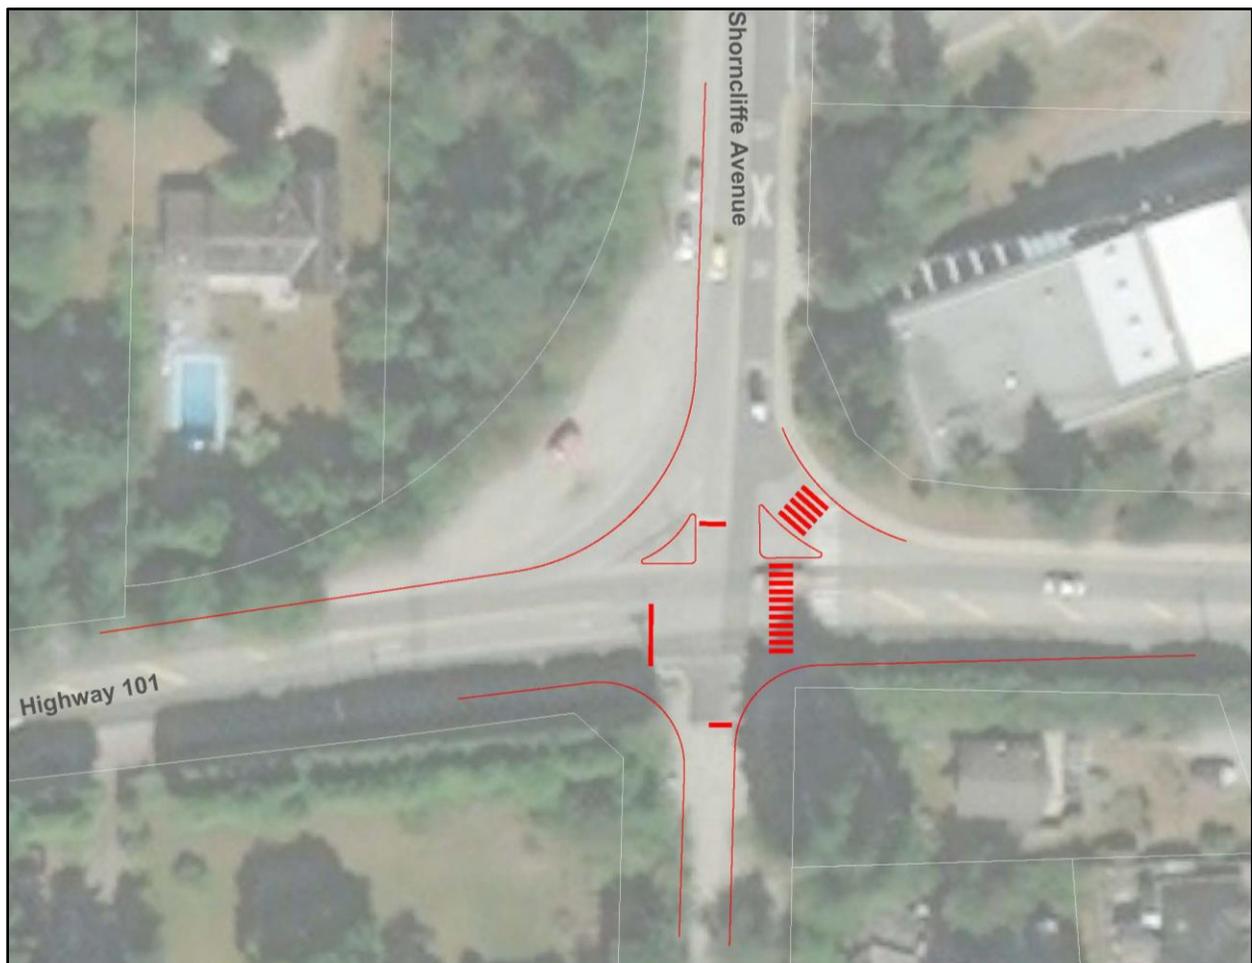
Proposed Improvements at the Shorncliffe Avenue Intersection
